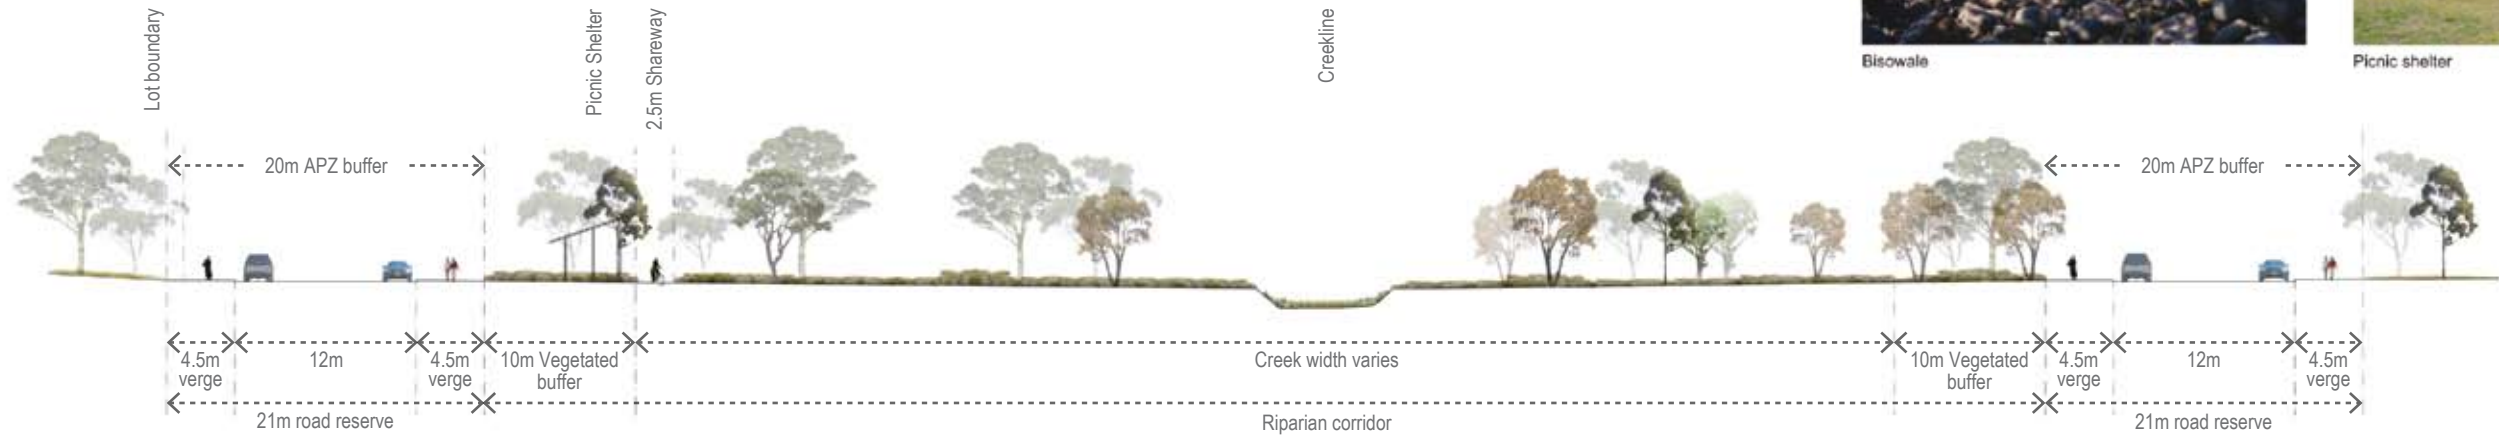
Typical Riparian Corridor Treatment - Section B-B
